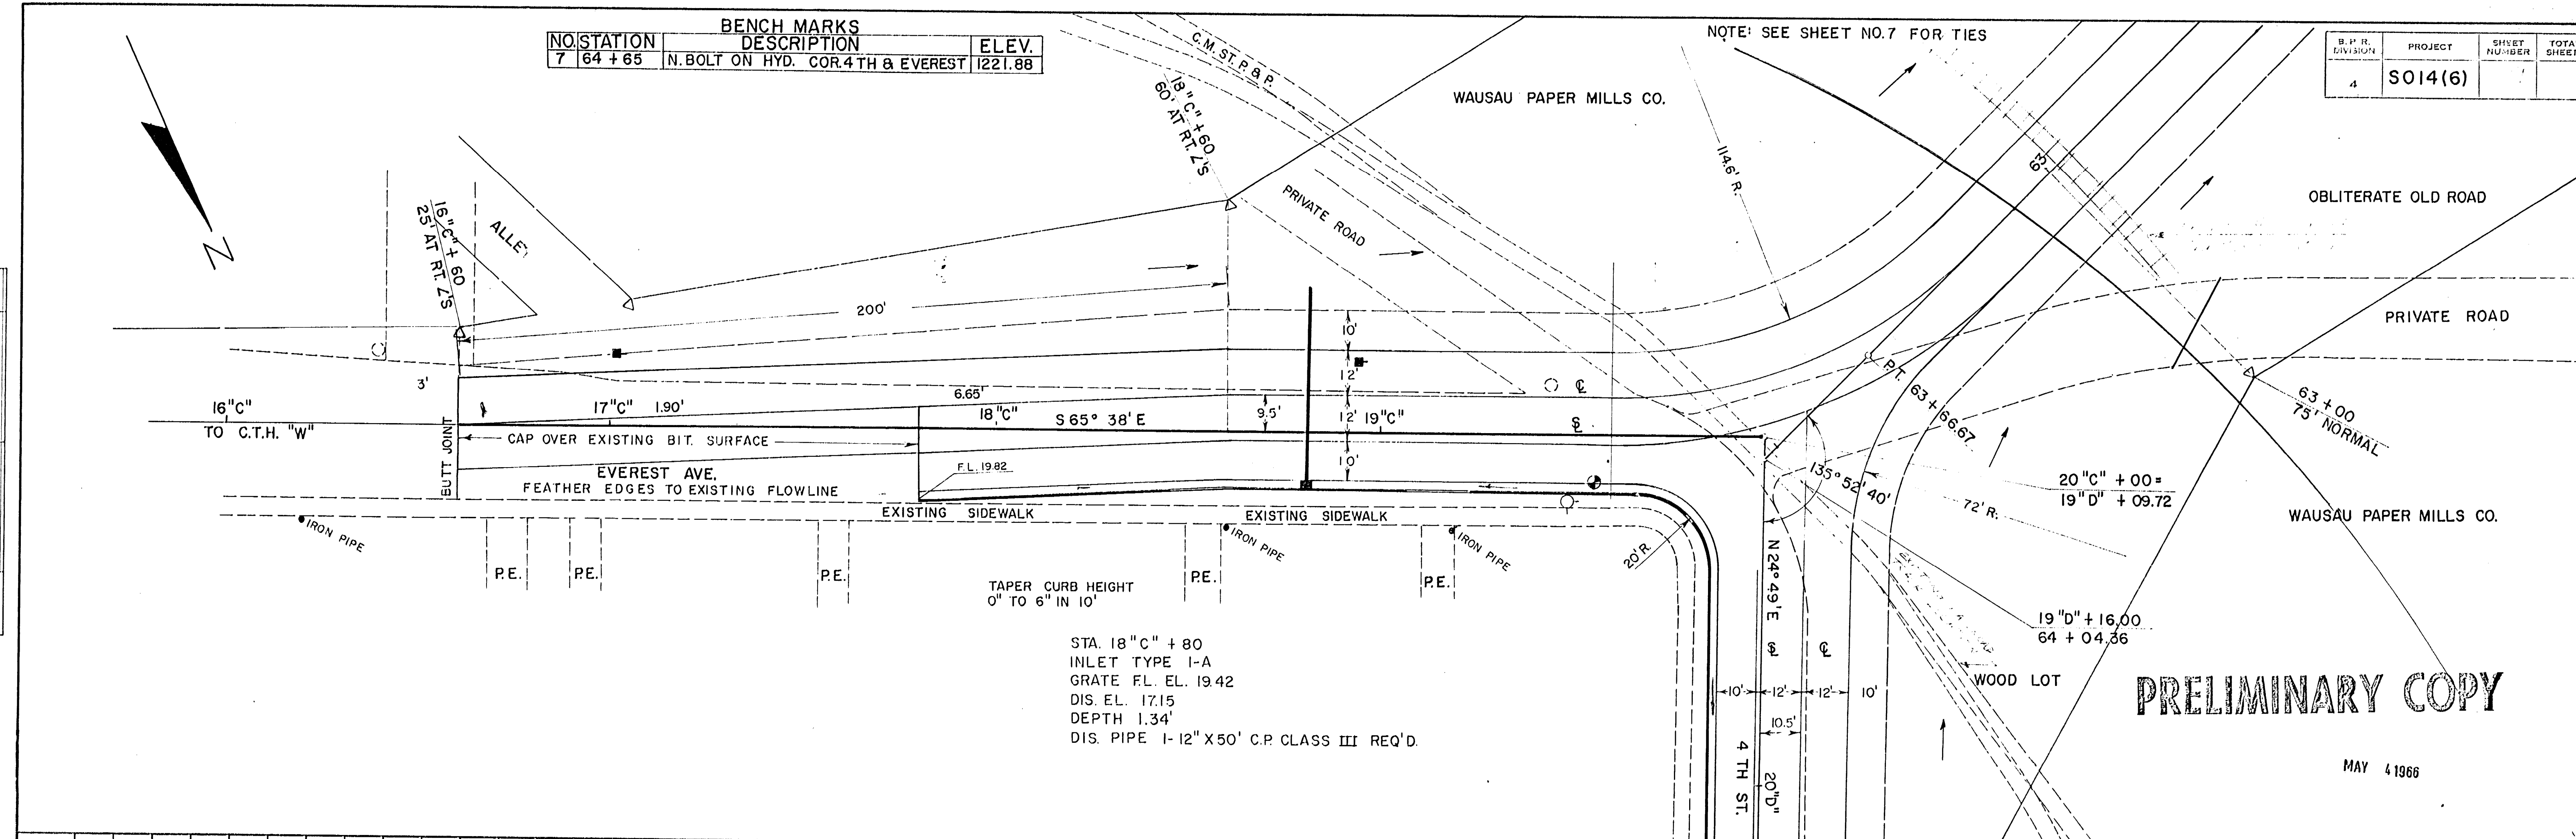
PLAN - PROFILE O. P. R. & R.E.
